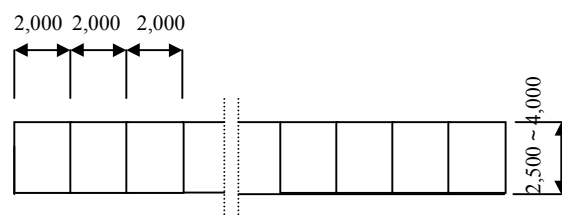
Preliminary Plan of Ticket Windows
